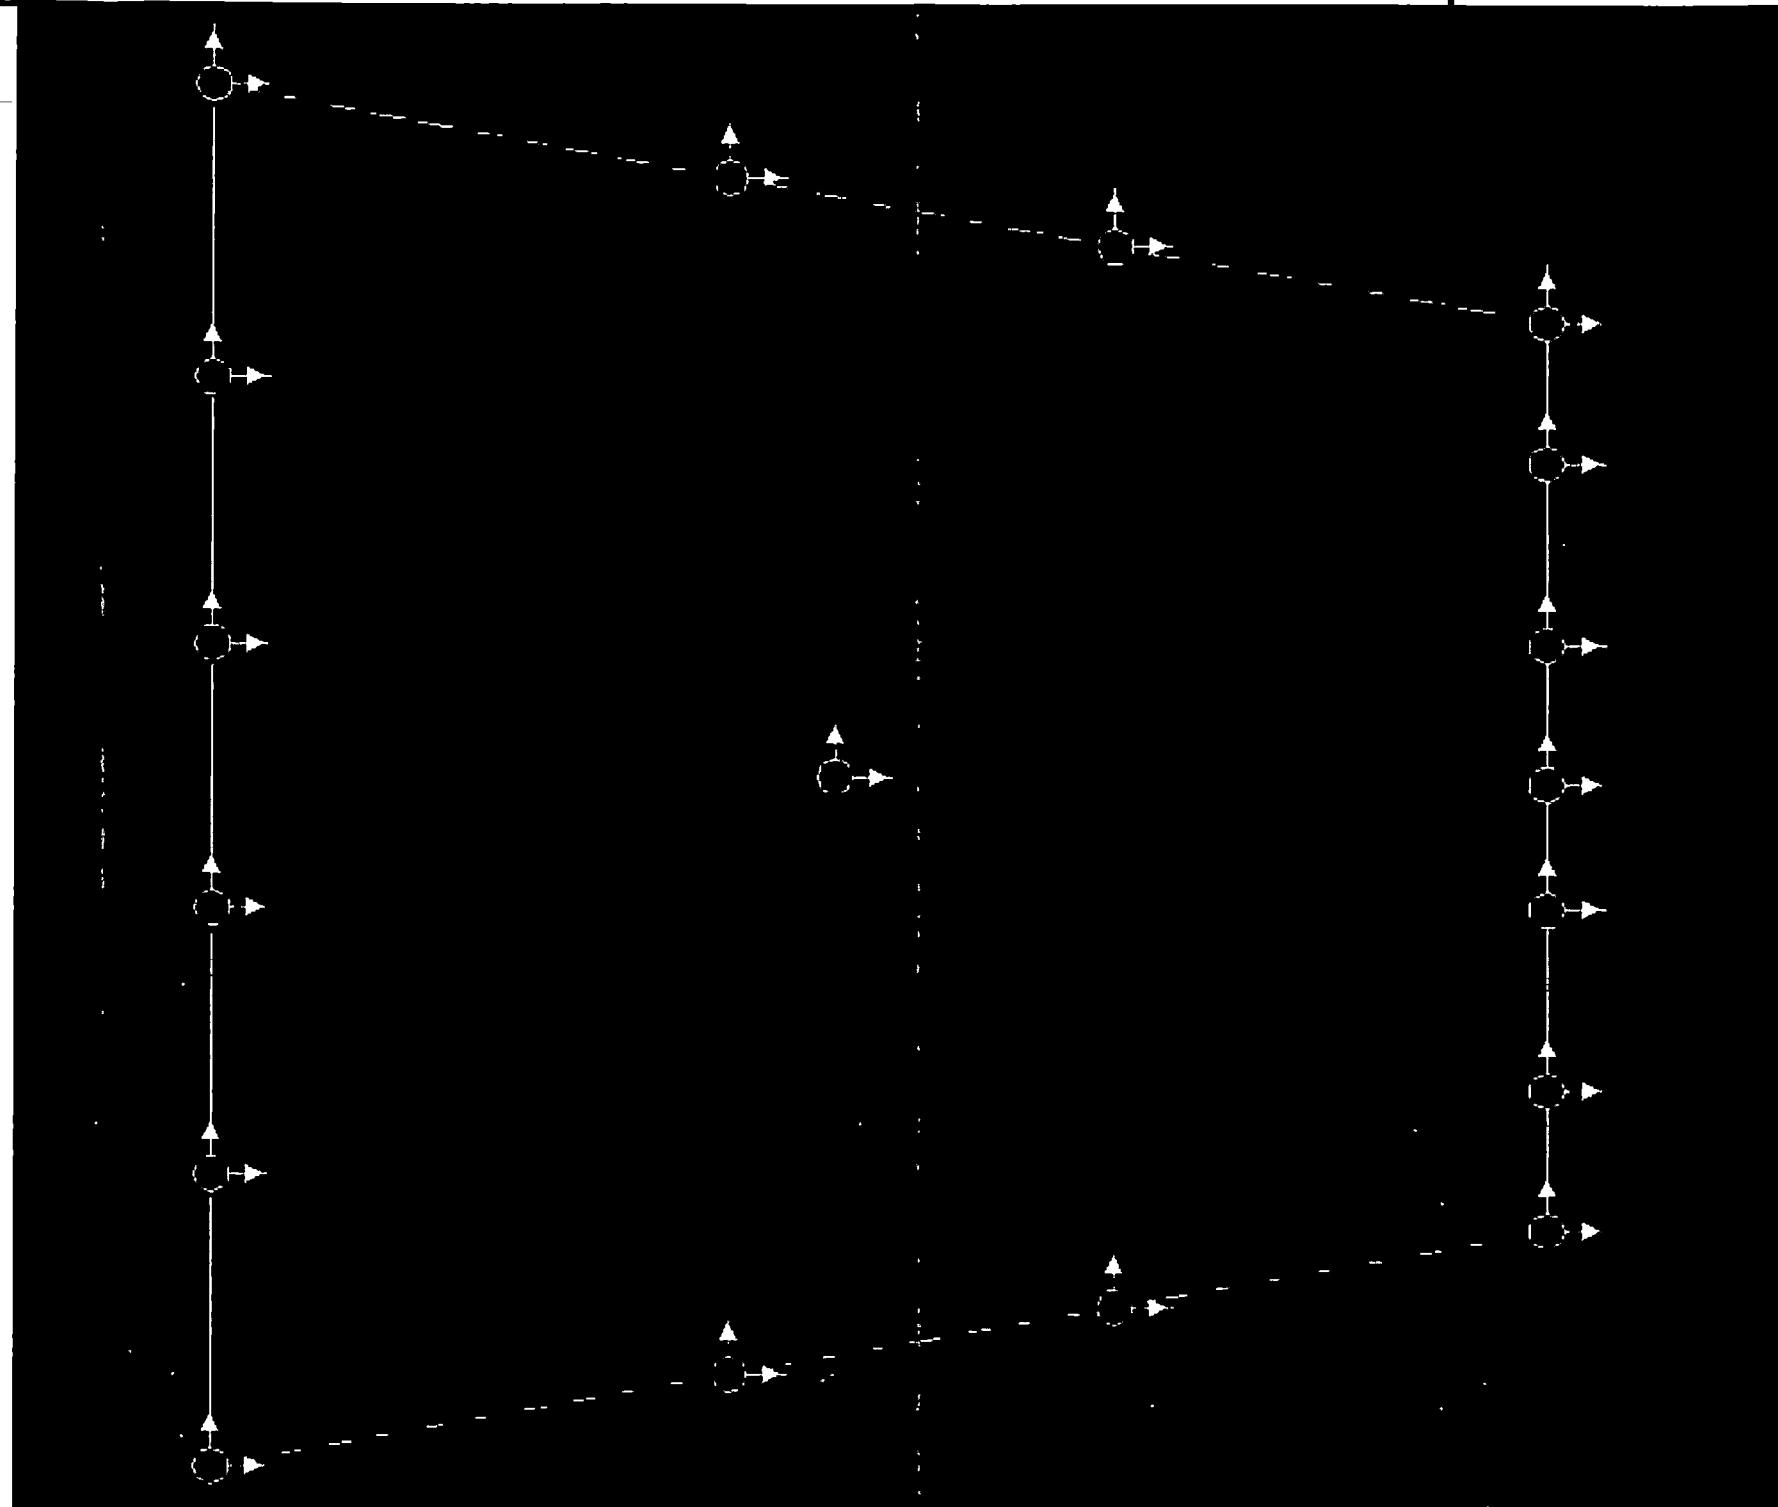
PERFORM-3D Model Lecture Hall Roof Plan View, Diaphragm Definition (H1, H2, RV Constraints)
